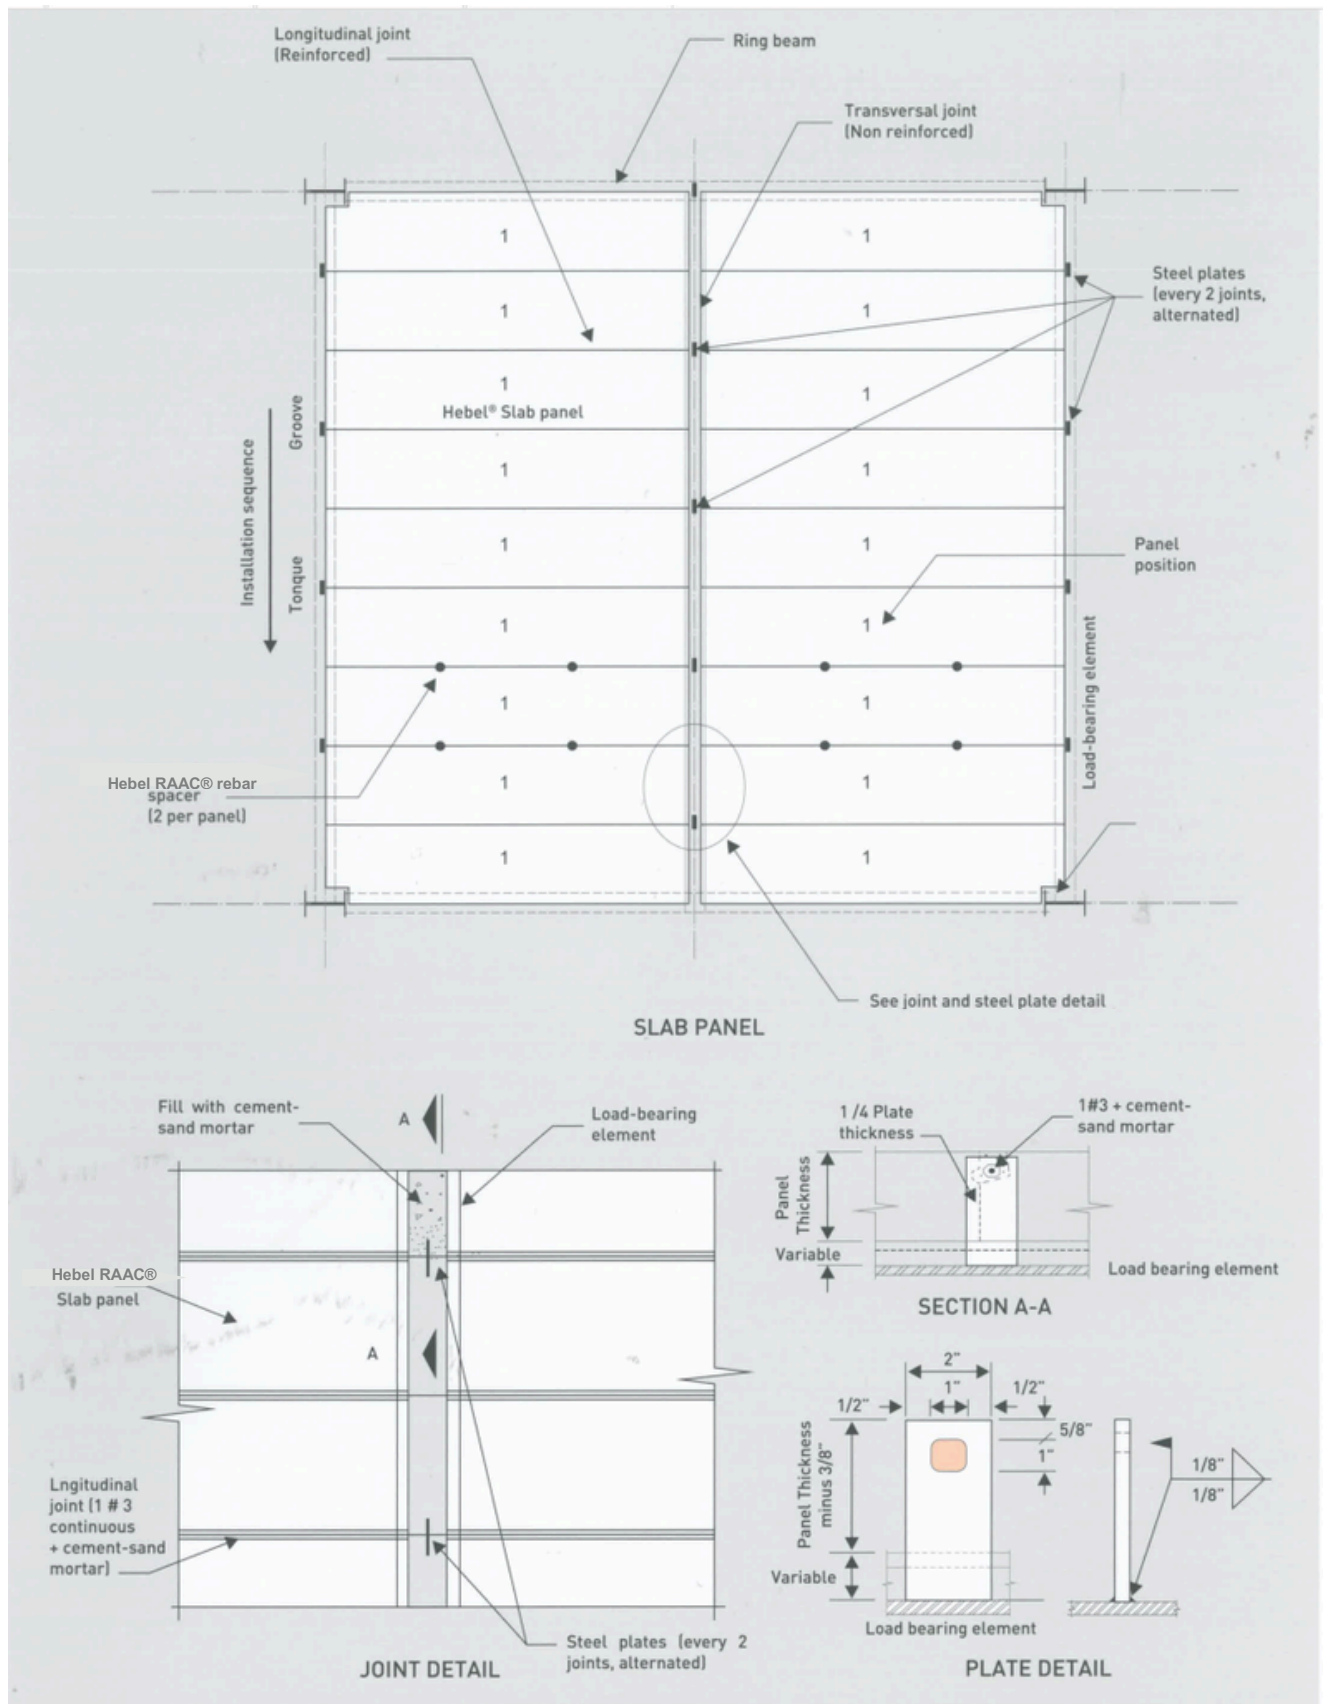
Hebel RAAC® Slab Panel over steel structure
